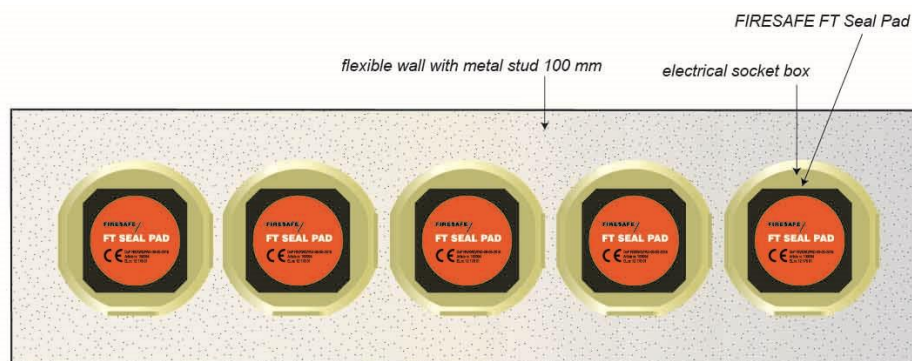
One to five electrical wall boxes in a row on one side of a flexible wall – front view
